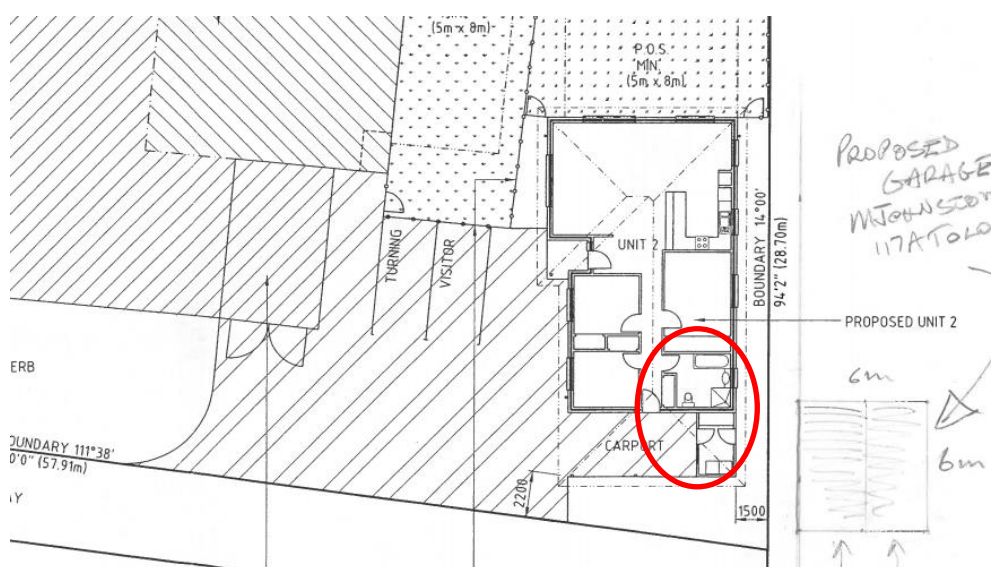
Floor plan of existing dwelling at 117 Tolosa Street which shows the non-habitable rooms(encircled) and the siting of the proposed garage with respect to the dwelling.
